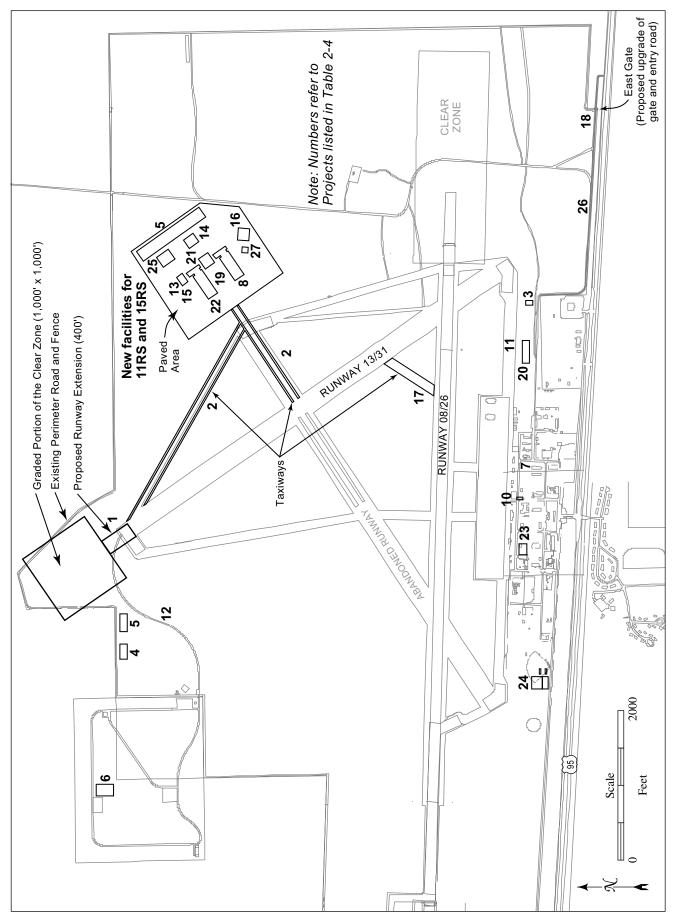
Alternative A or Alternative B Proposed Beddown Facilities
